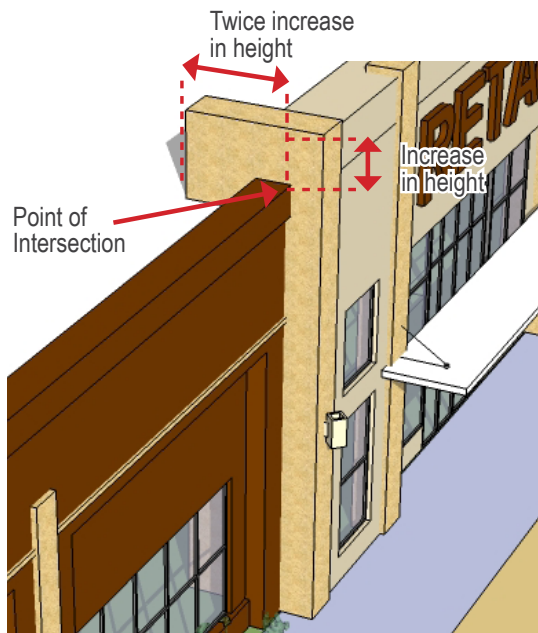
S2: Diagram illustrating parapet roof depth standard.
